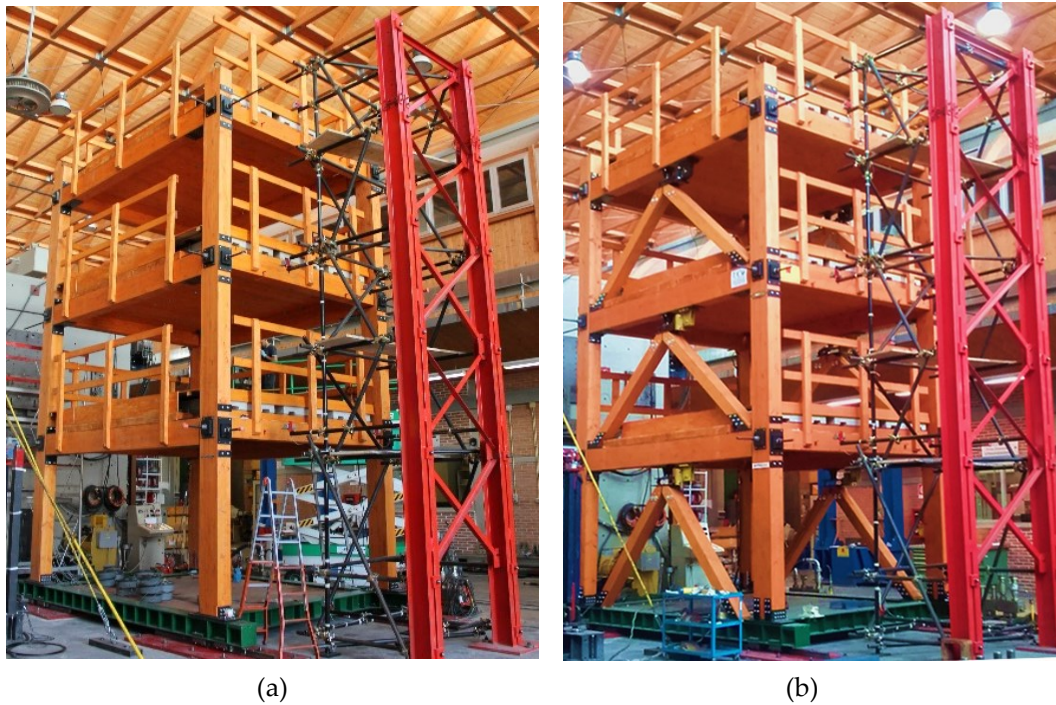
General views of experimental model at the structural laboratory of University of Basilicata: (a) post-tensioned timber bare frame (F configuration); (b) post-tensioned model with dissipative bracing systems (BF configuration)
